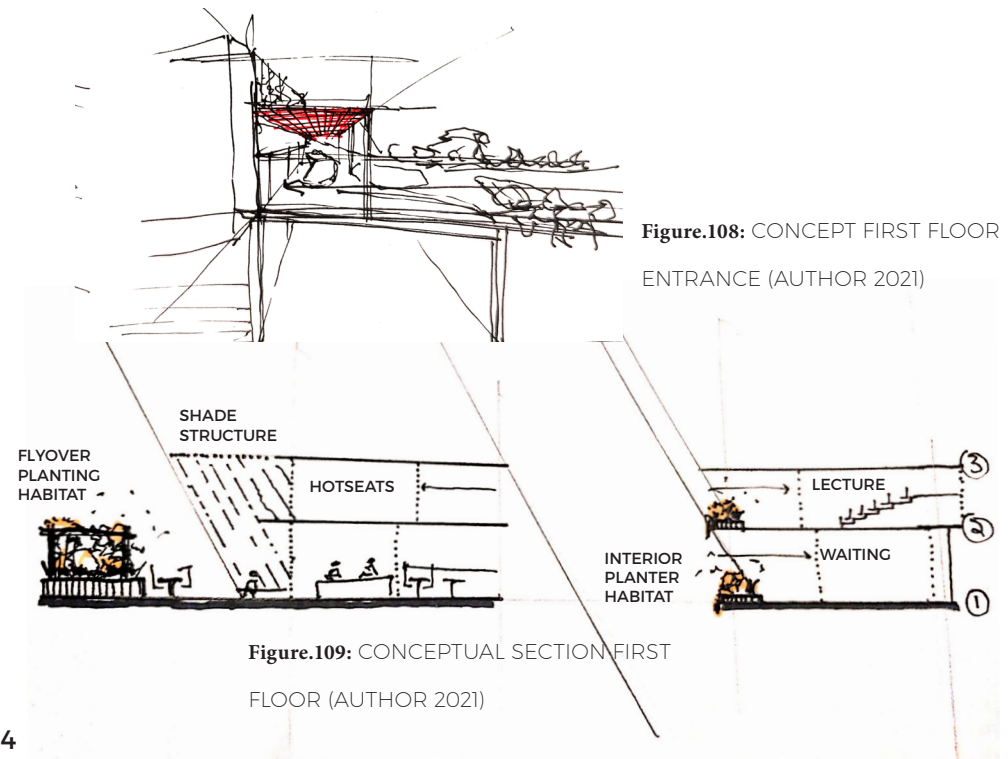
CONCEPT FIRST FLOOR ENTRANCE (AUTHOR 2021)
